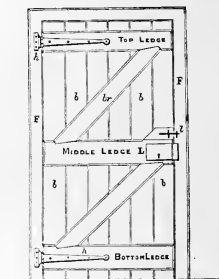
Inside Elevation of Ledged and Braced Door.
